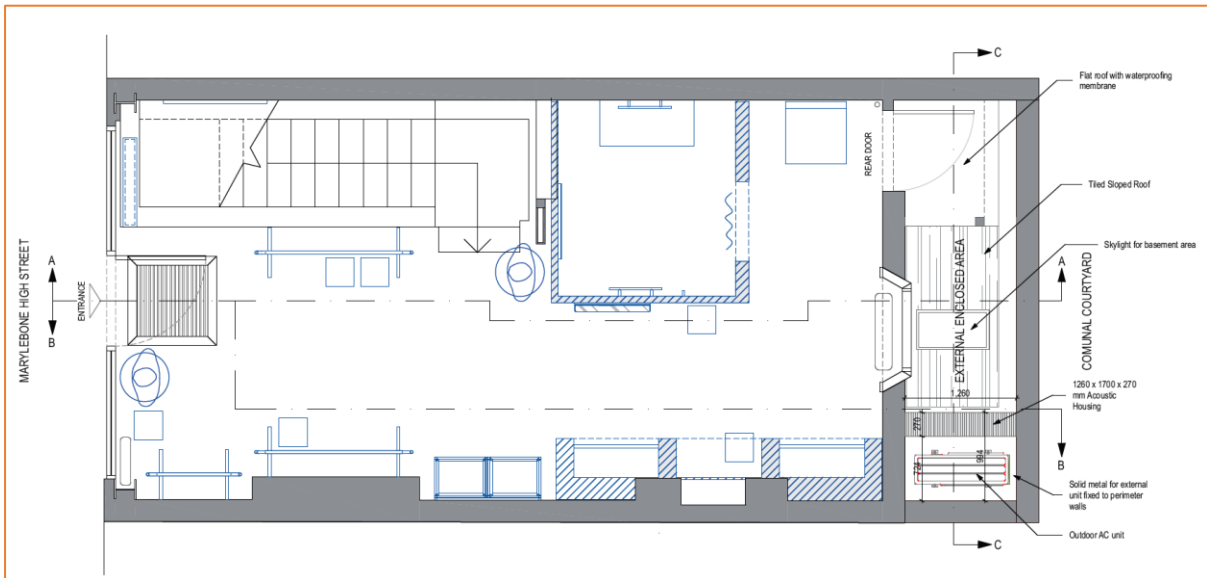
Proposed Ground Floor Plan (Source: Gregori Chiarotti Projects)
